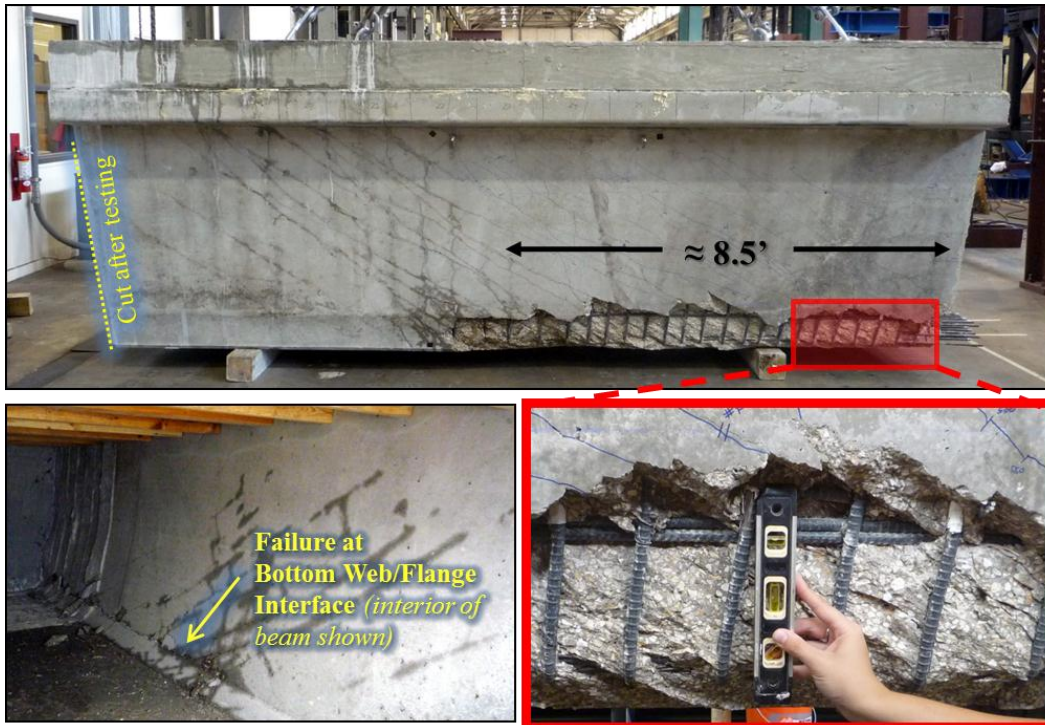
Beam 3 South, Web-to-Flange Interface Failure Crack
